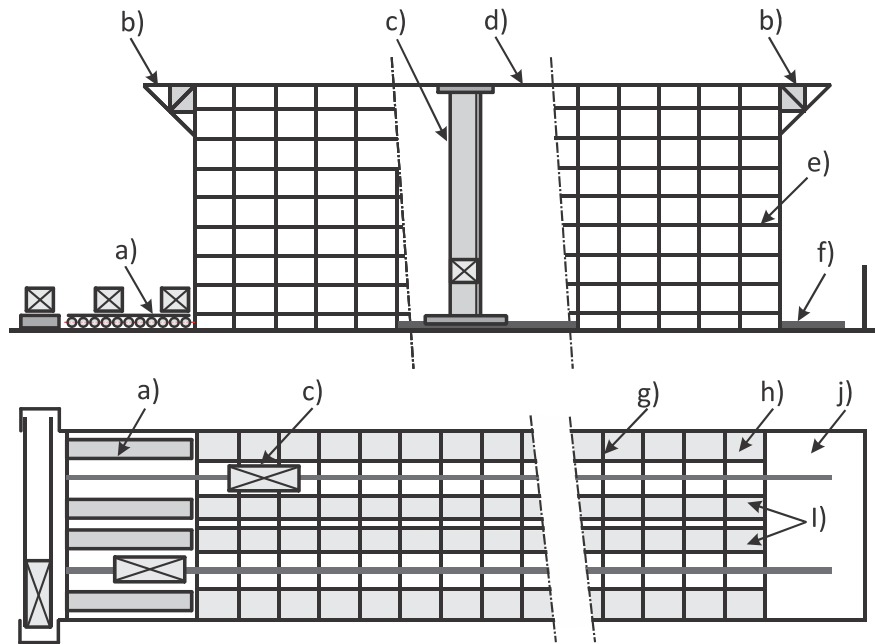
Narrow aisle racks: a) conveyors, b) S/R machines run-out, c) S/R machines, d) upper guide rail, e) beam, f) bottom rail, g) portal tie beam, h) single entry run, i) double entry run, j) maintenance area
